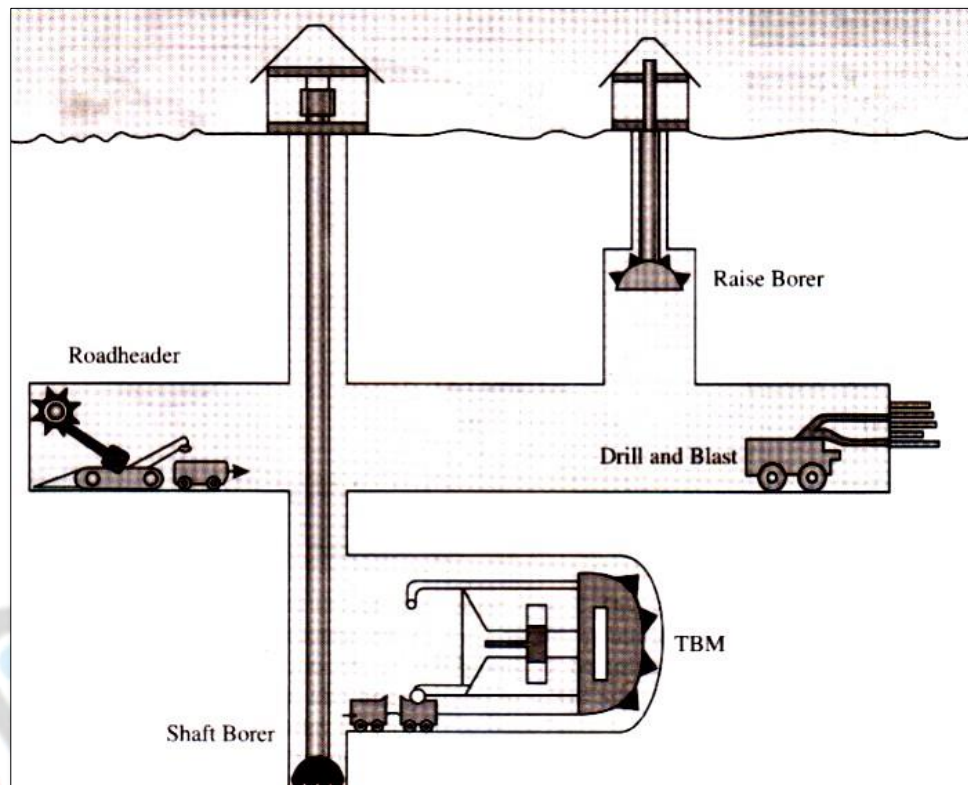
Different boring machine, shaft and raise borer, road header, drilling and blasting boomer and tunnel boring machine.
